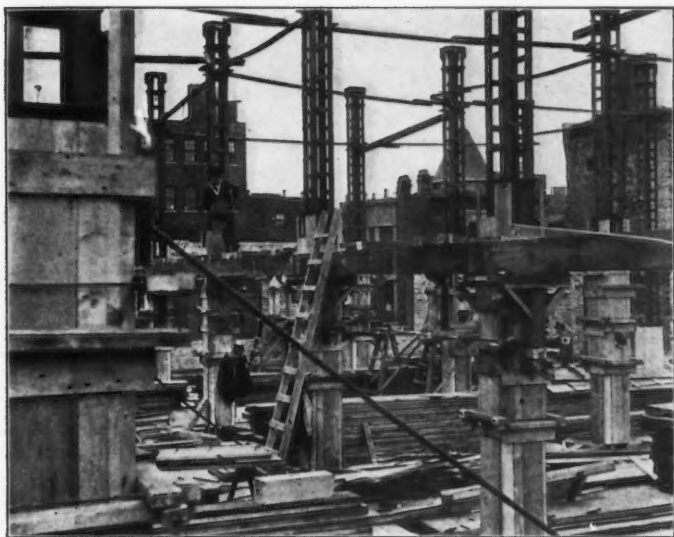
SECOND AND THIRD-STORY COLUMN REINFORCING, WATSON BUILDING.
